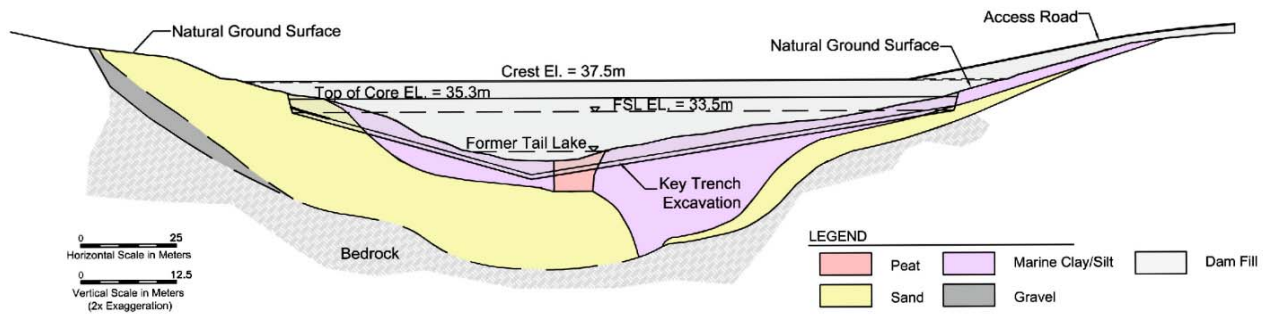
Long section of North Dam, displaying the complex foundation conditions
